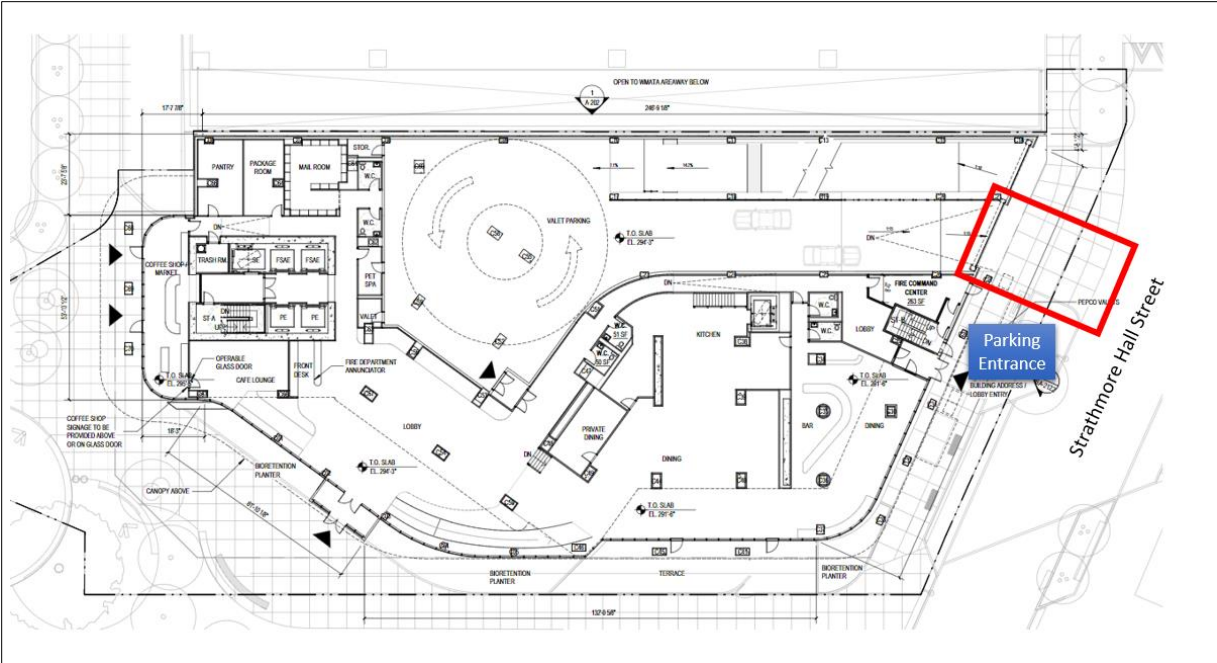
Valet Parking Area on Ground Floor of Building 5
